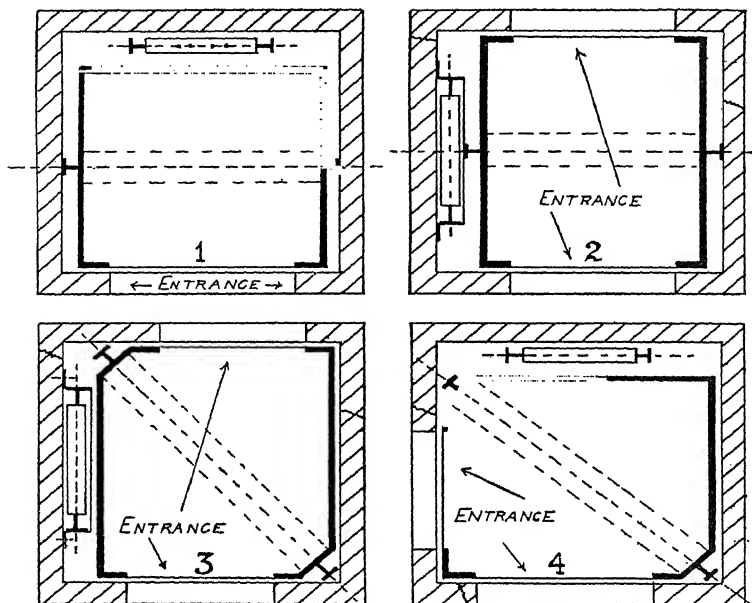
Arrangement of car guide rails and counterbalance weights.
